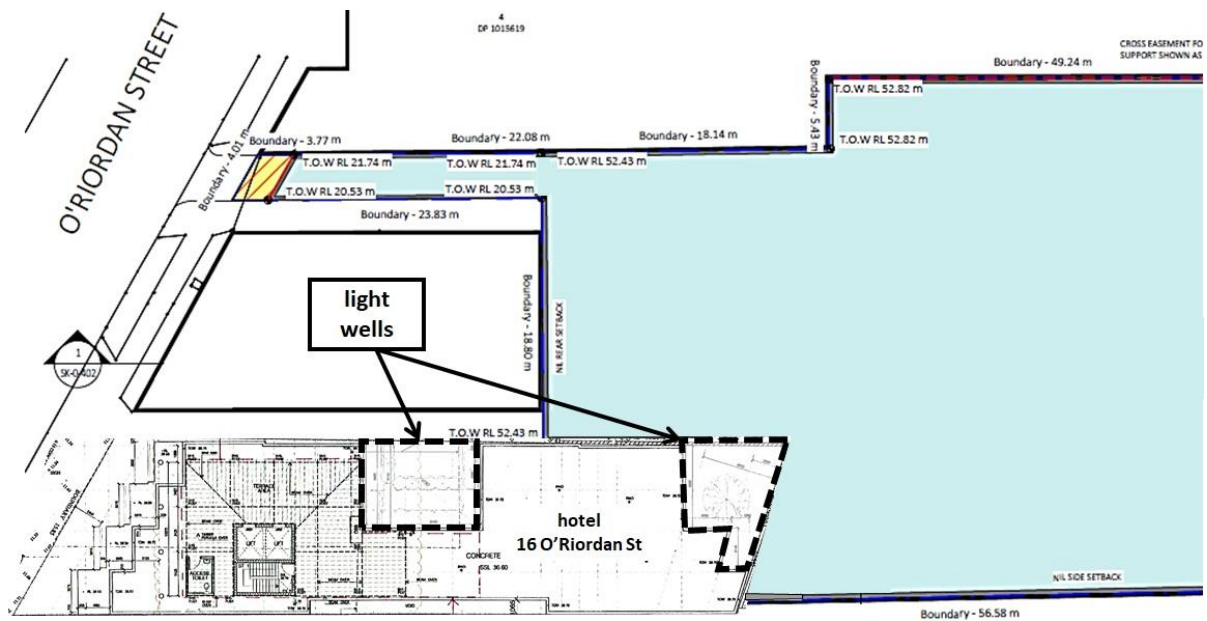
Envelope plan relative to adjacent hotel light-wells at 16 O'Riordan Street.
